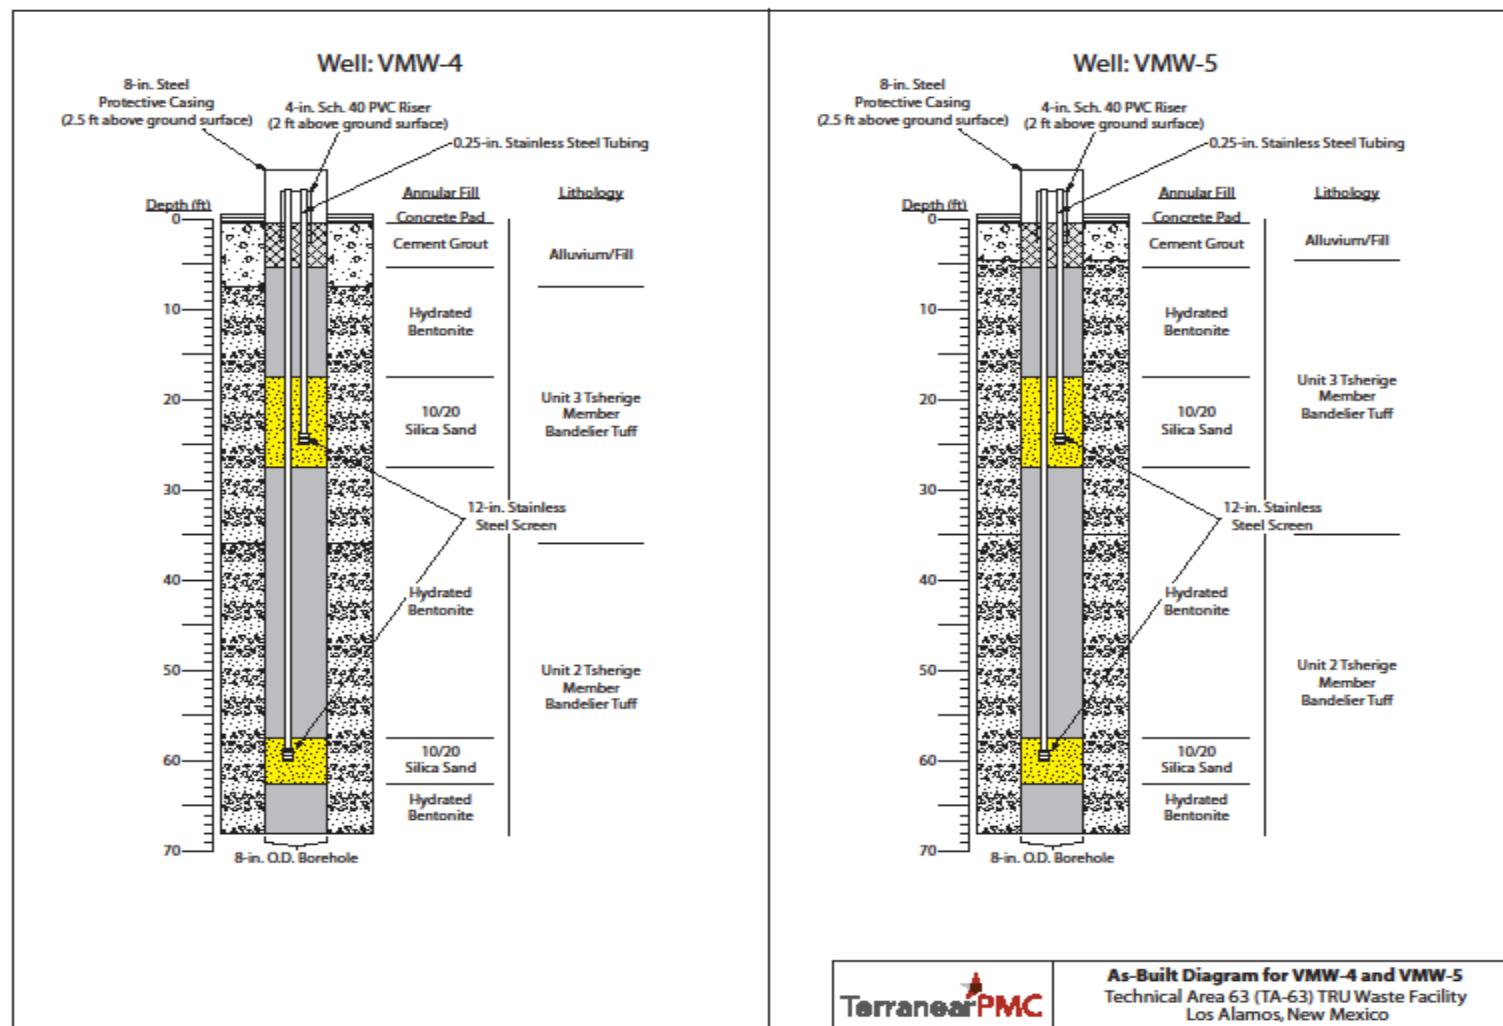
VMW-4 and VMW-5 Well Construction and Lithologic Details.
